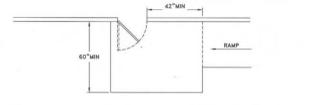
ENCROACHMENT OF DOORS ONTO RAMPS
